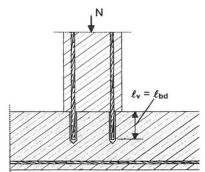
rebar connection for components stressed primarily in compression; rebar is stressed in compression
